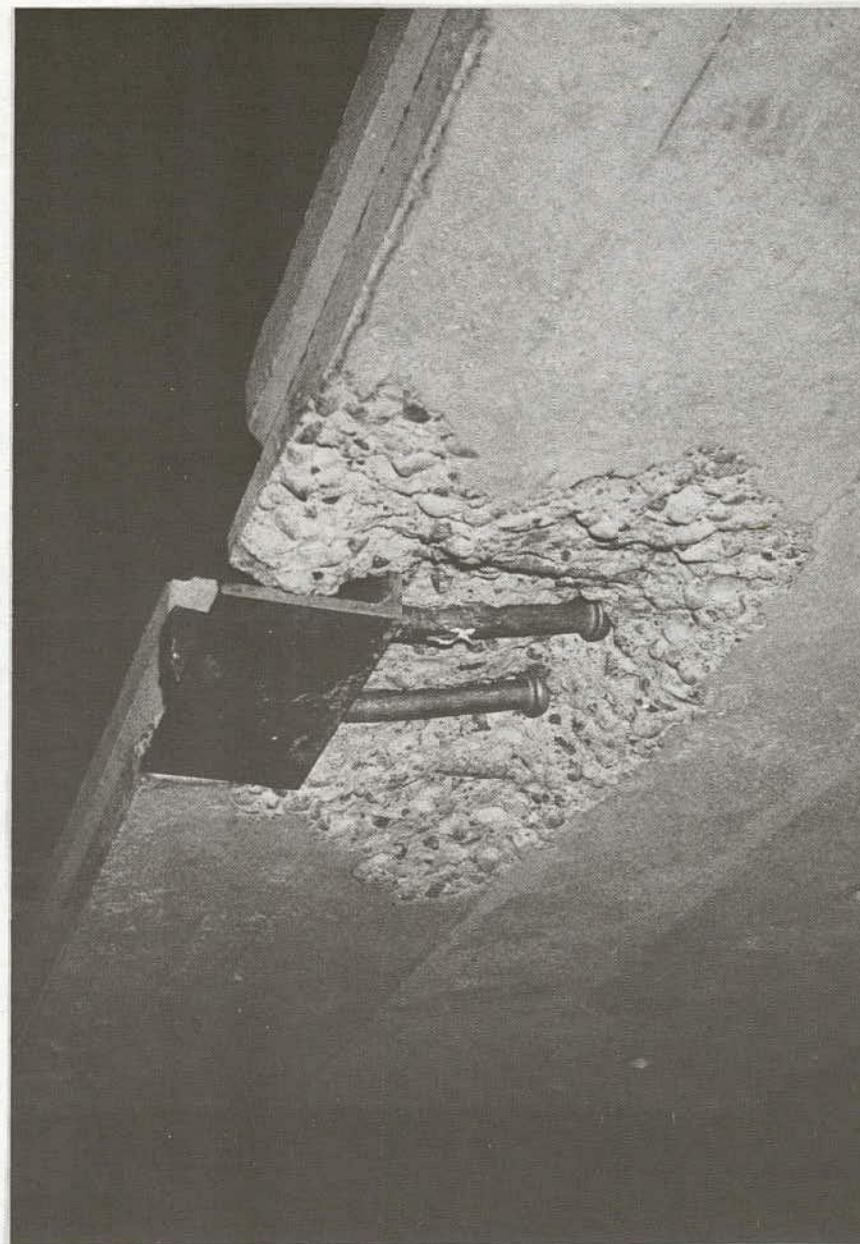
Specimen 3A, underside of cantilever slab after test—loose concrete removed and connector hardware replaced in original position.
